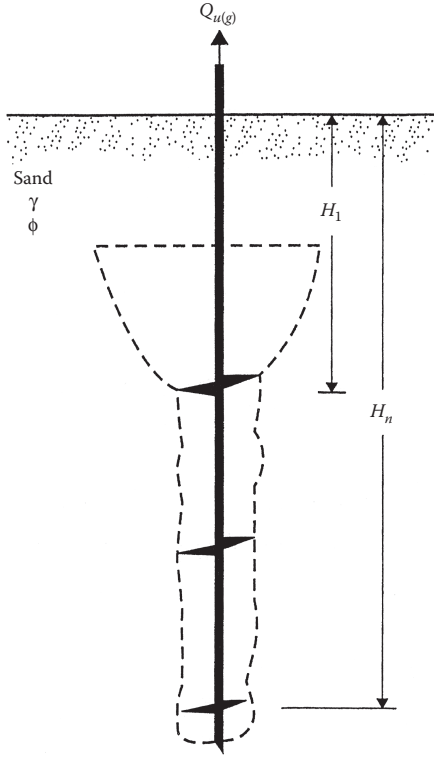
Typical failure pattern in sand around a multi-helix anchor for shallow anchor condition.
